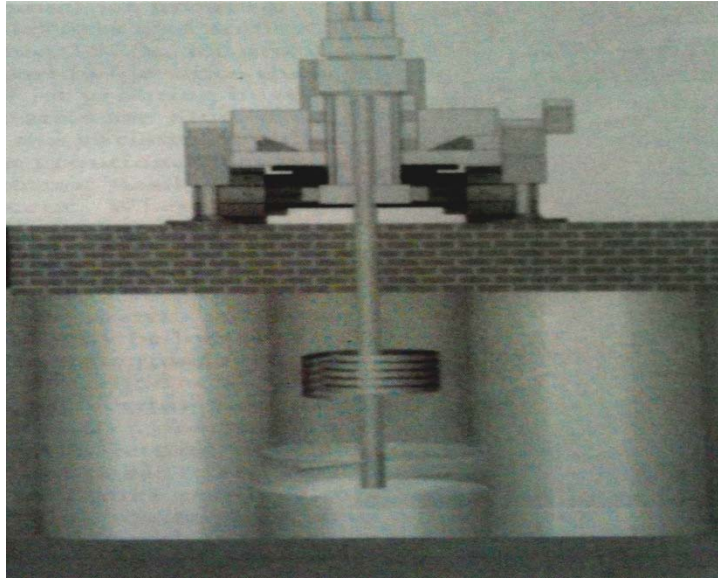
Jet grout column construction (Essler and Yoshida, 2004)
